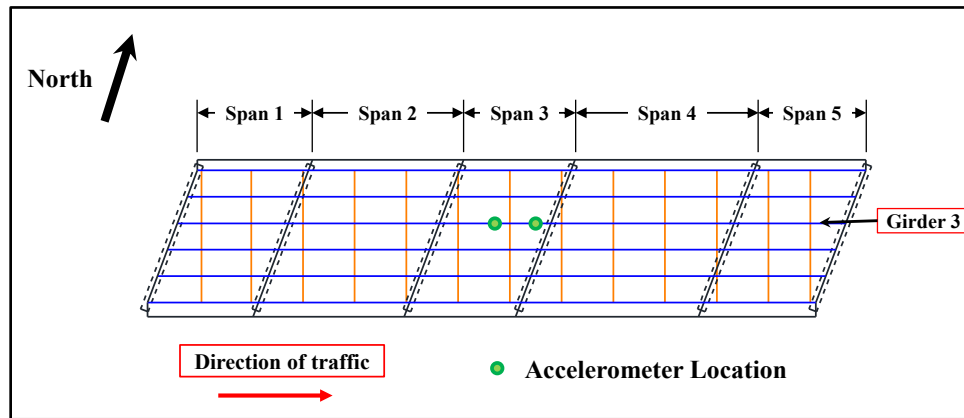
Plan view with the accelerometer locations at Bridge C
